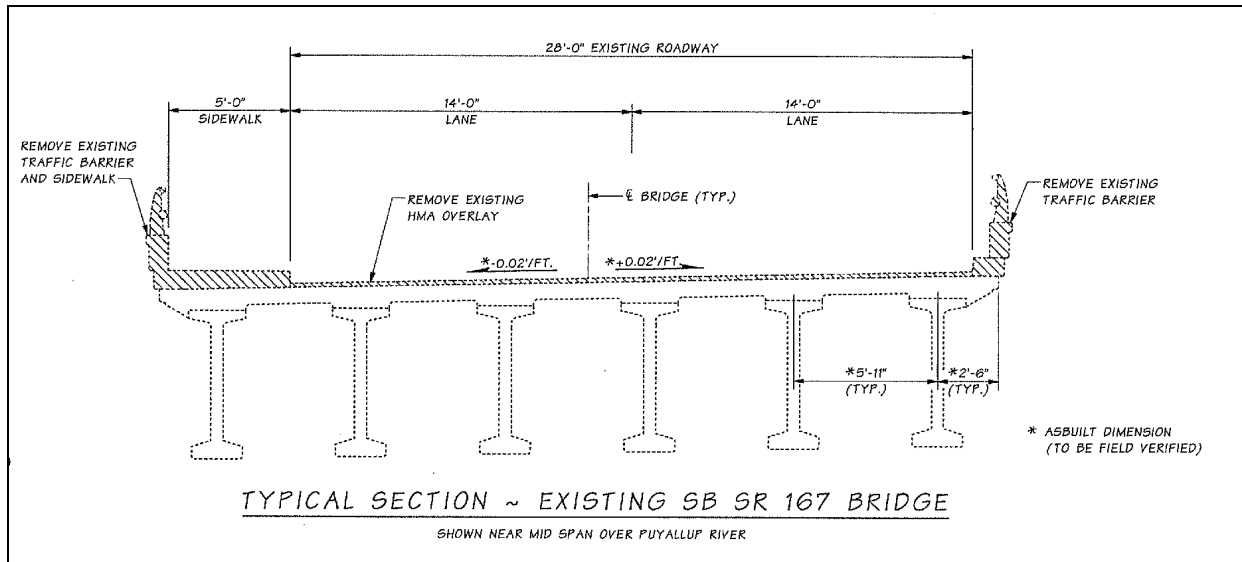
Cross Section of Existing 1970 Bridge (currently southbound lanes)
